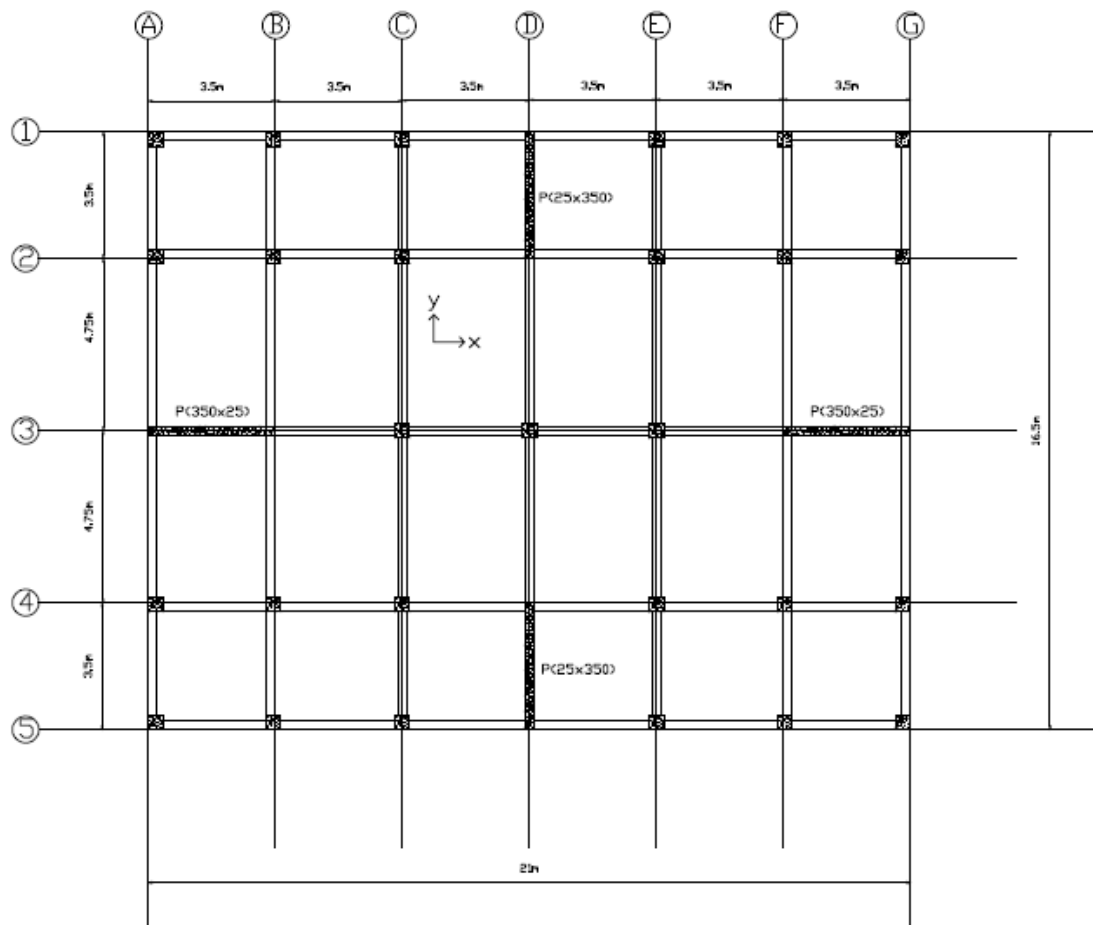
Plan of Model 1 with 0.5% Wall Area to Floor Area Ratio in Each Direction
